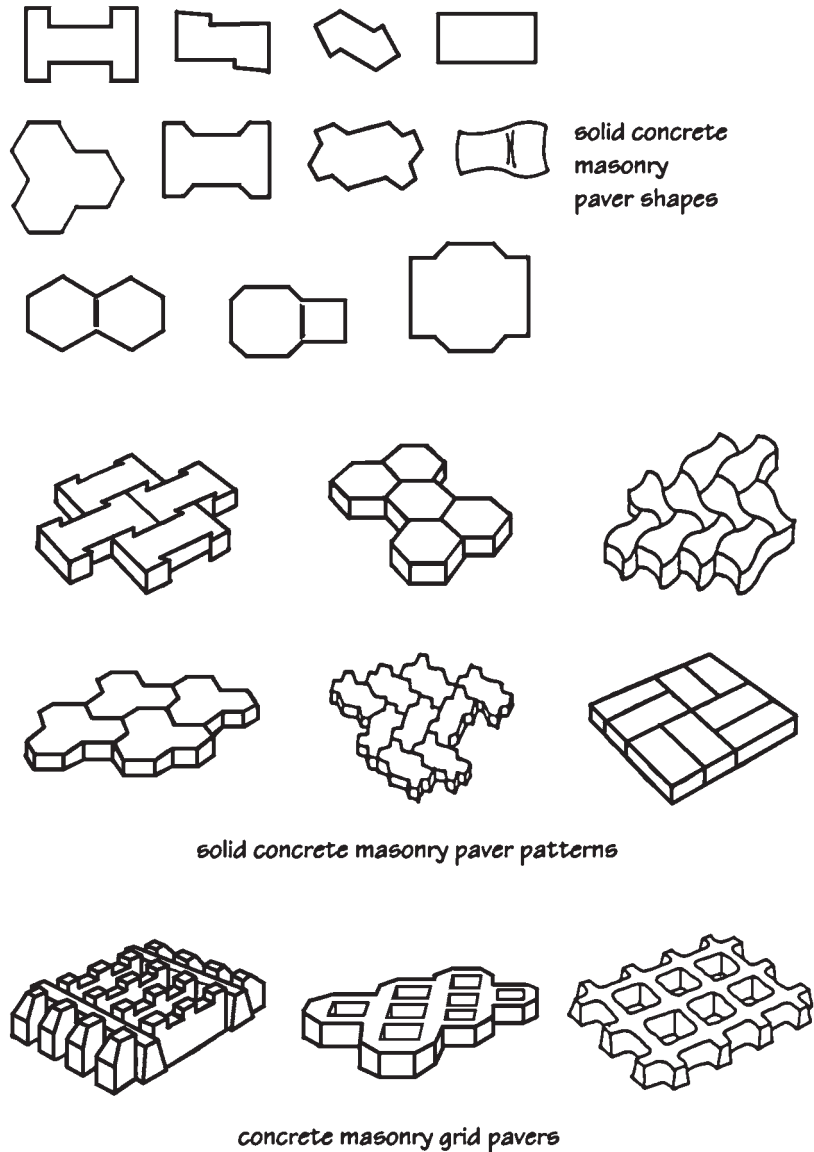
Concrete masonry paving units. (From *National Concrete Masonry Association, TEK 11-3, NCMA, Herndon, VA.*)
